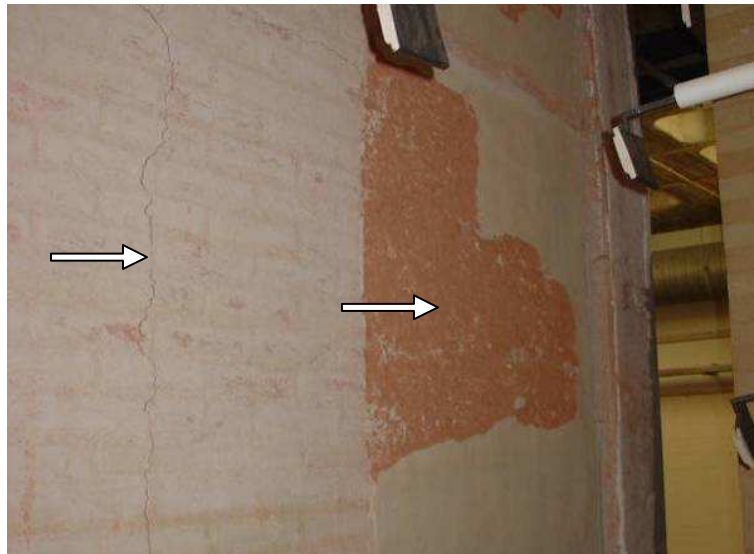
Vertical crack in the centre of the wall face directly exposed to fire. Detail of plaster detachments.
